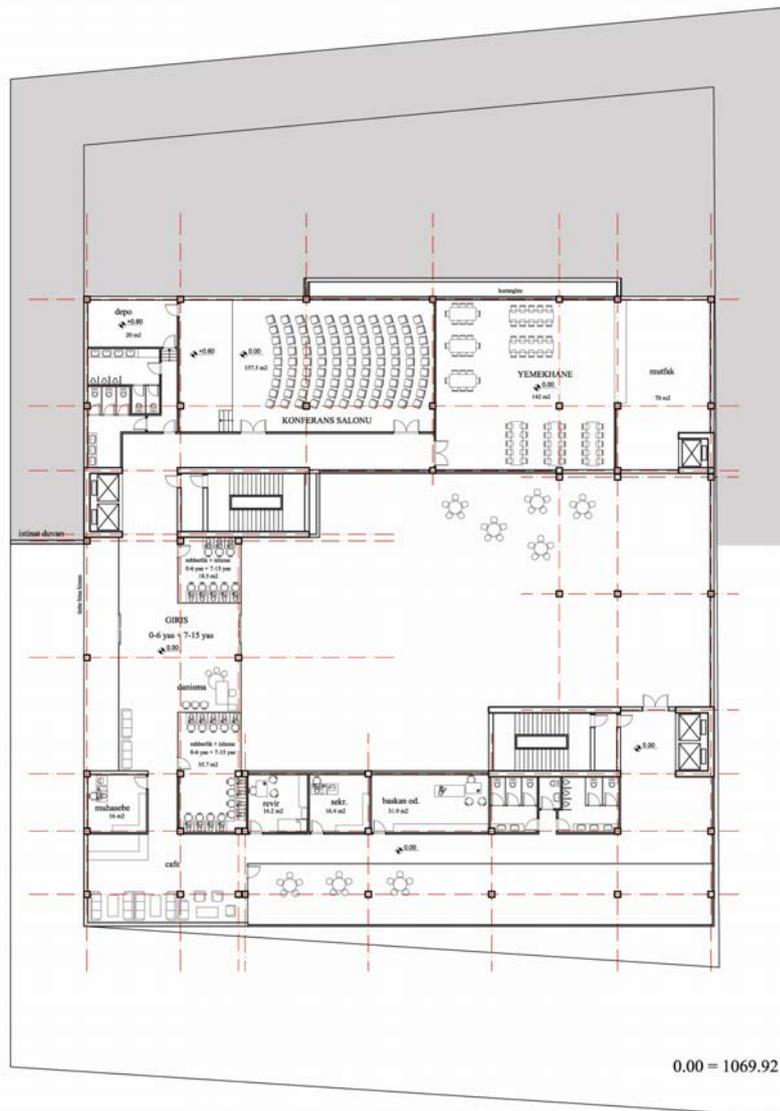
Ground Floor Plan / Preliminary design for Private İlgi Special Education School
